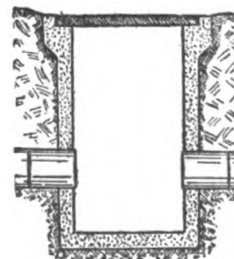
A combined open catch basin, silt basin and inspection basin. (Kansas Report.)
